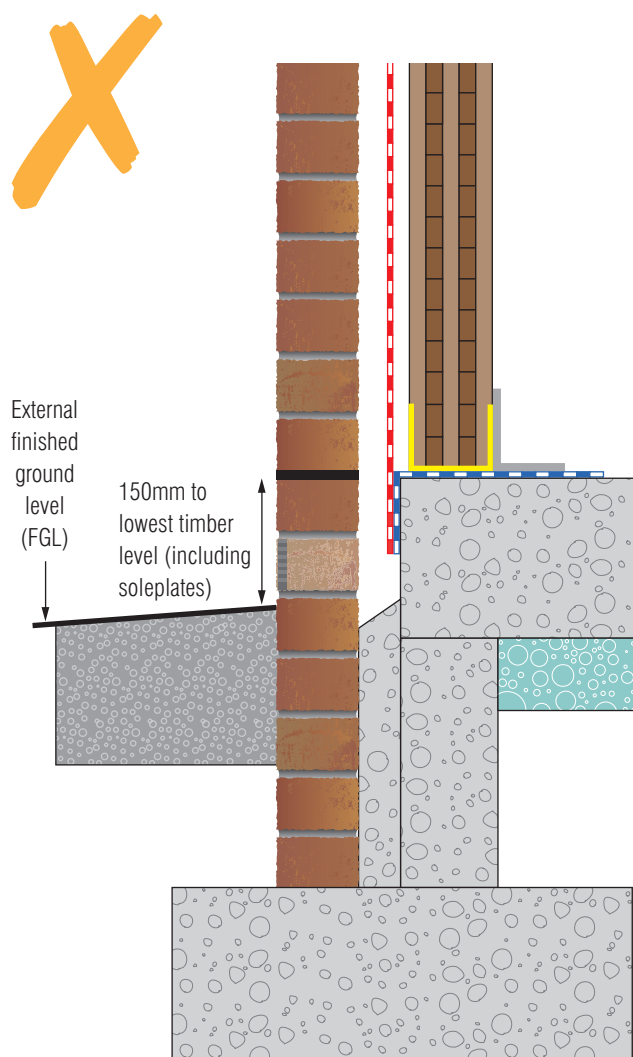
Unacceptable external wall details - CLT not 150mm above external ground level
